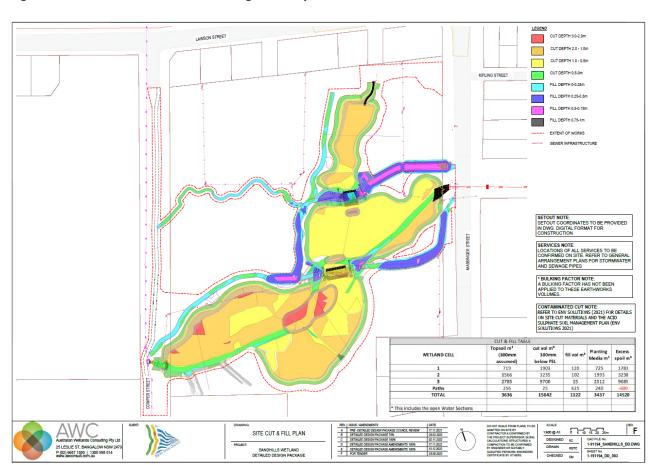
Sandhill's Stormwater Management System Site Cut and Fill Plan
